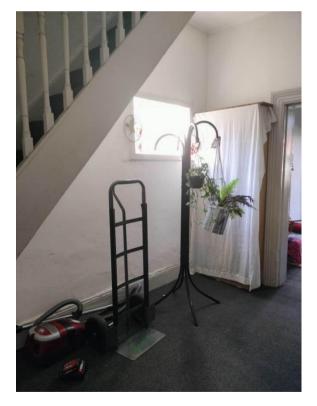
Backroom and stairwell within 75 Crown Street. Carpet in this room was damp and musty. Source: Curio 2023
